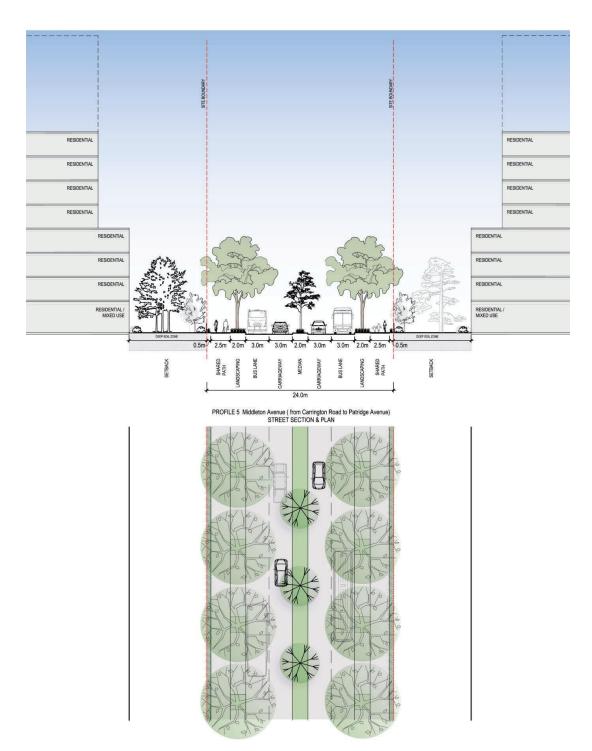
Middleton Avenue (from Carrington Road to Partridge Avenue)
